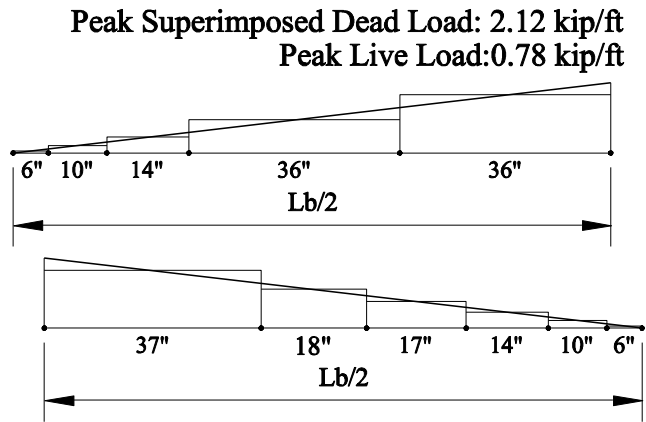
Gravity load discretization. Note that this arrangement corresponds to the beams on the left bay of the test frame. The frame is symmetric about the interior column.
